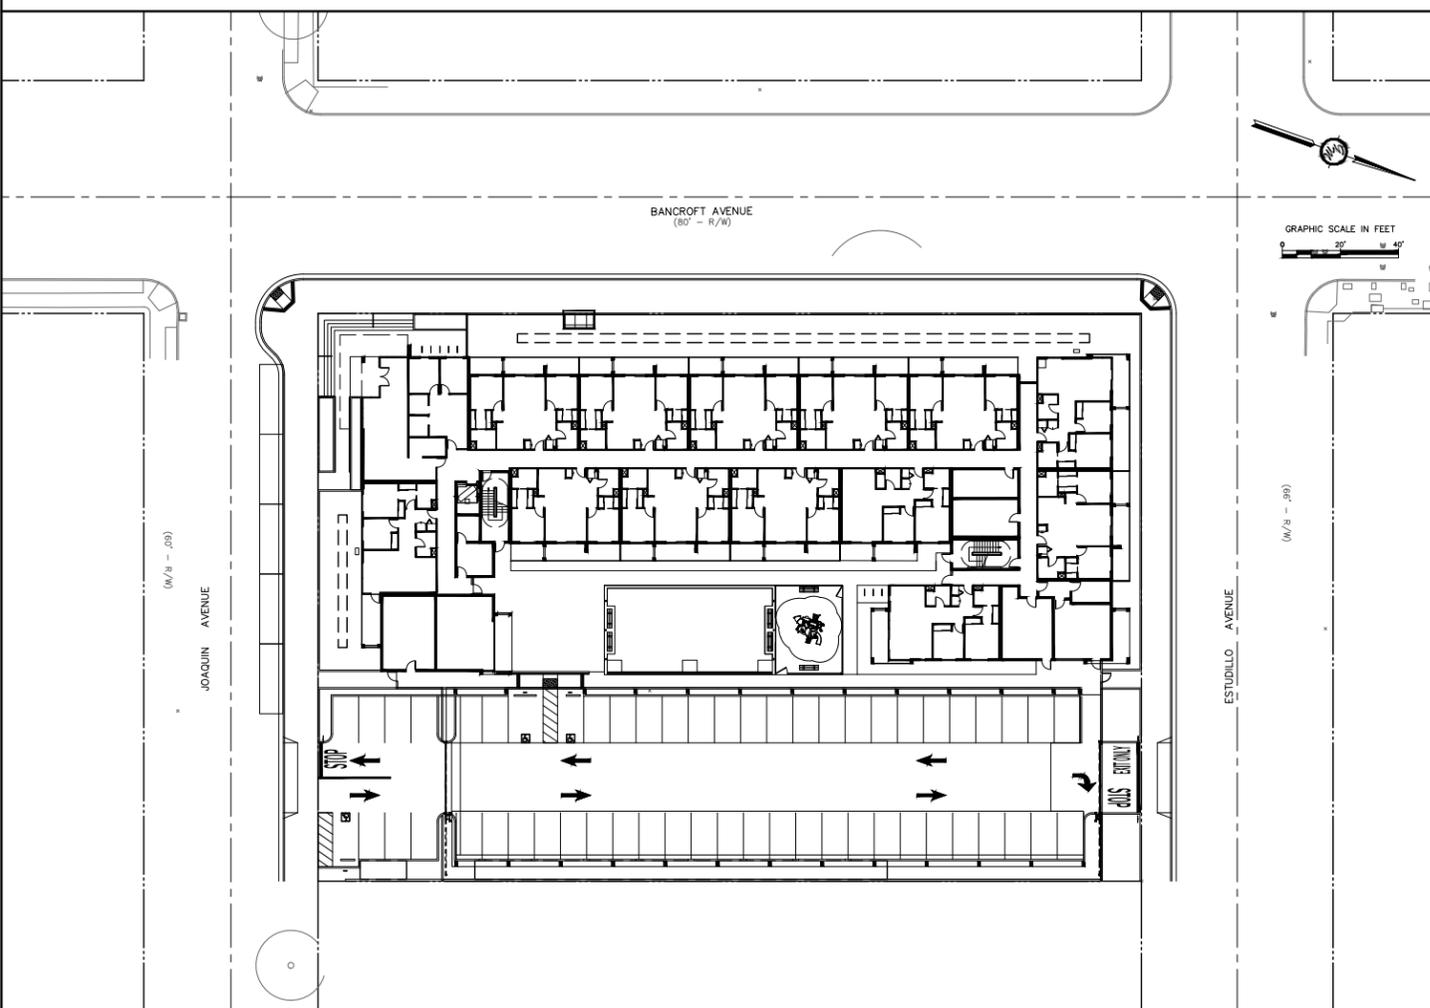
EXHIBIT V - COVER SHEET CIVIL ENGINEER IMPROVEMENT PLANS
